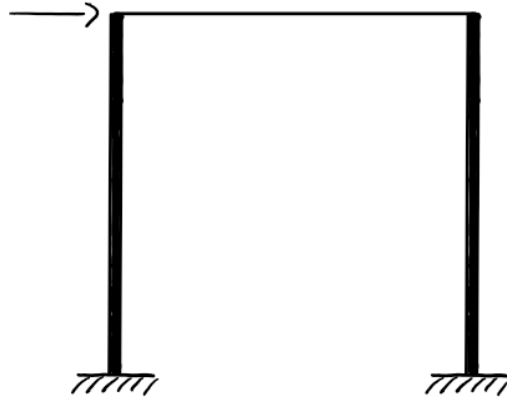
Fixed base portal frame with columns significantly stiffer than the beam, subject to a horizontal load in the top left corner.
